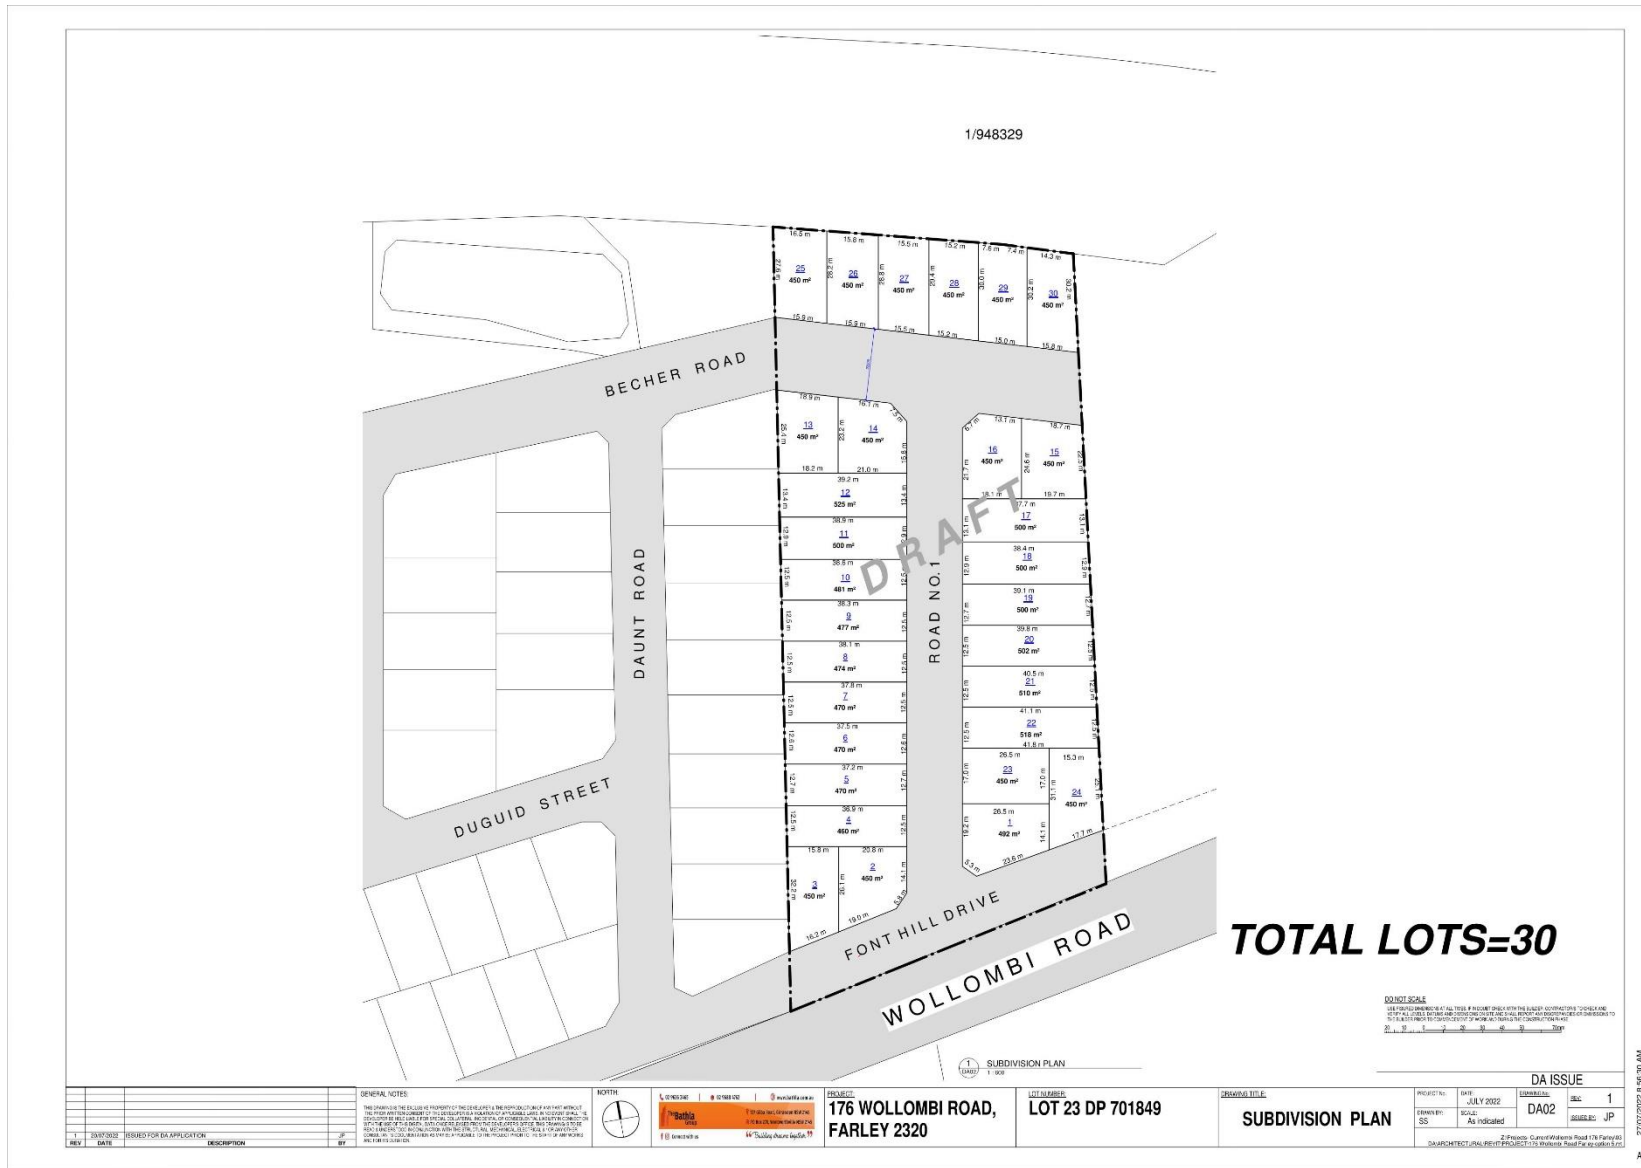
Subdivision Plan (Provided by The Bathla Group)
